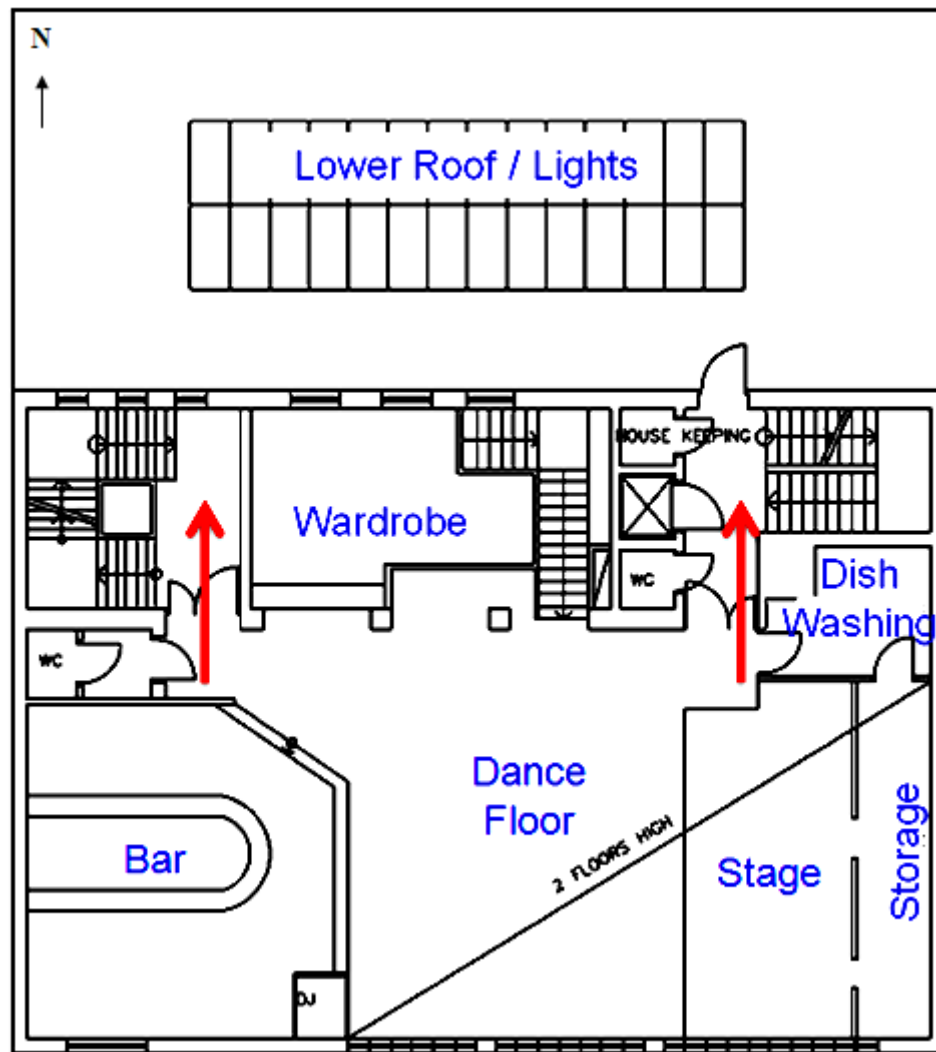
Floor plan of the proposed nightclub – Floor 2
